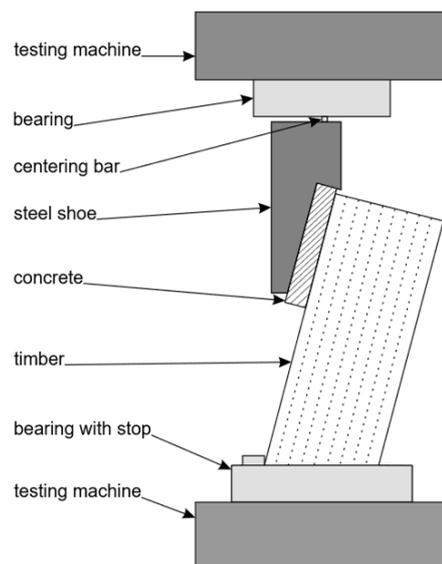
Technical drawing of experimental test setup of inclined bond tests [5].
